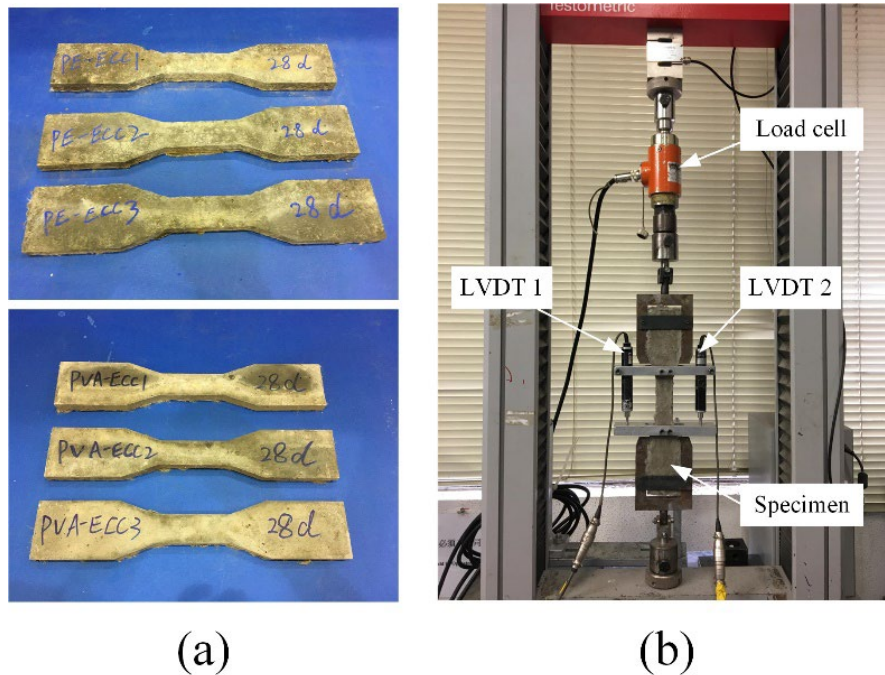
Tensile tests: (a) dogbone-shaped specimens and (b) loading setup.
